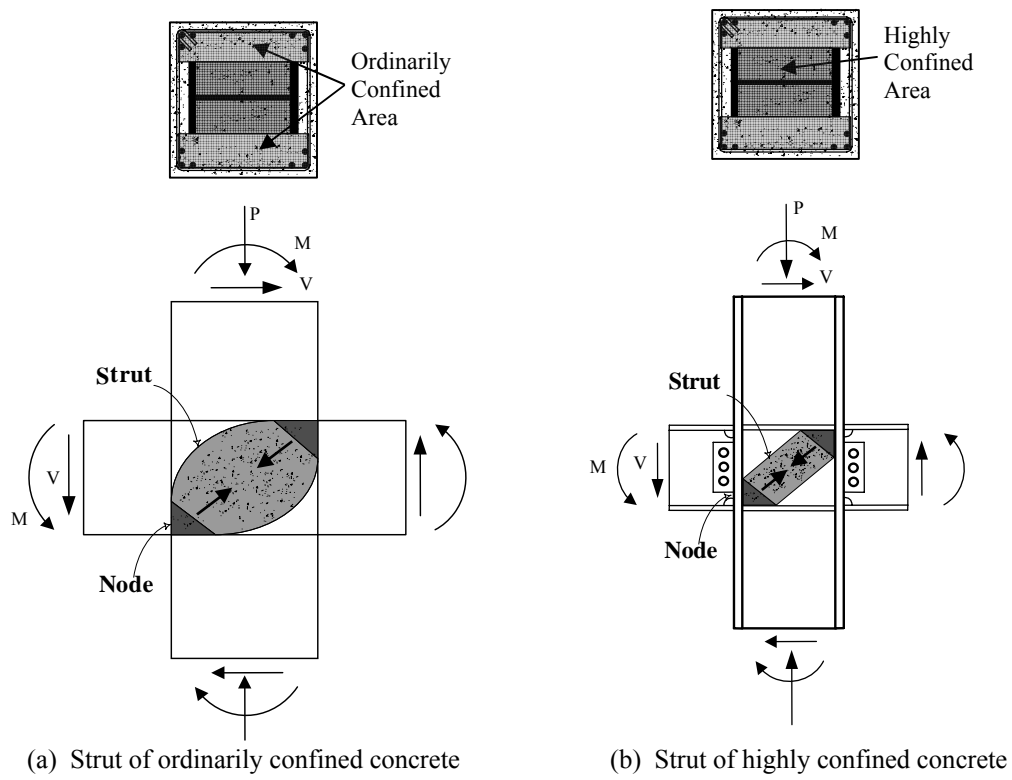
Compressive strut of concrete in SRC beam-to-column joint
